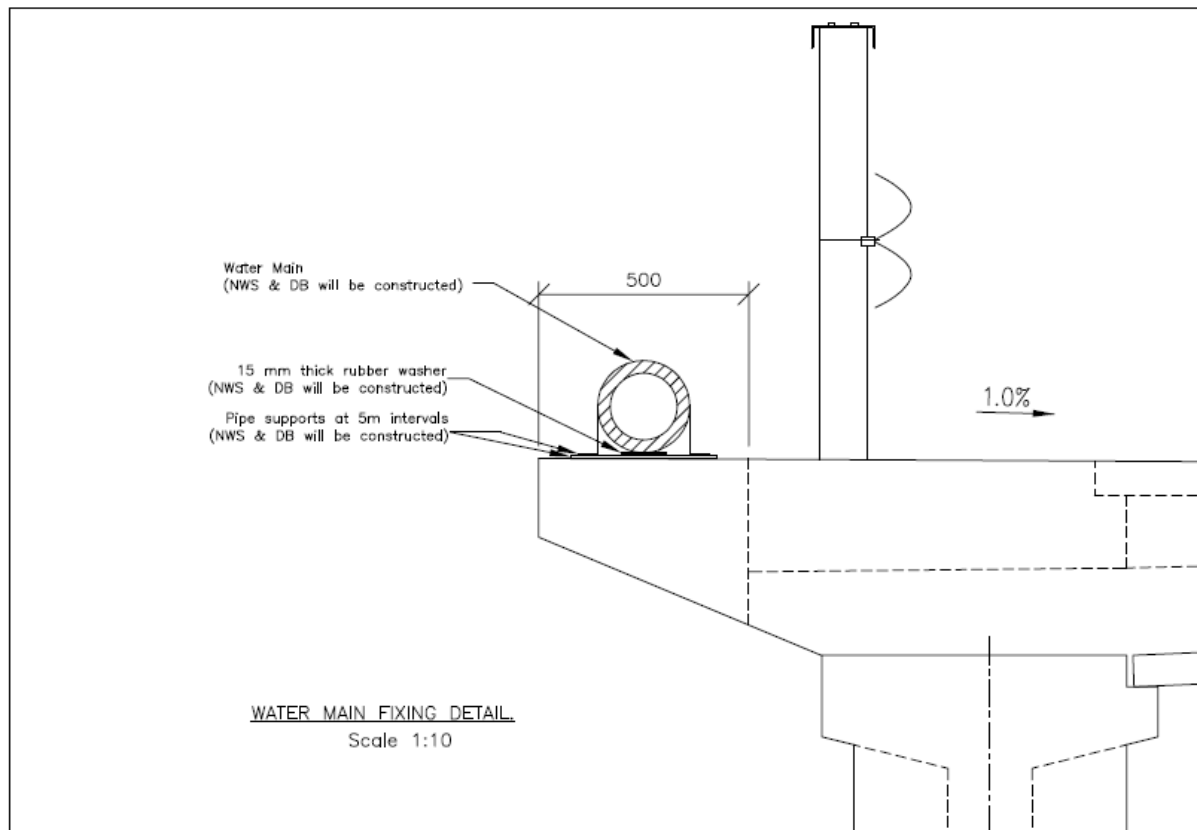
Water-Pipe Fixing Details (For Small Pipe)
